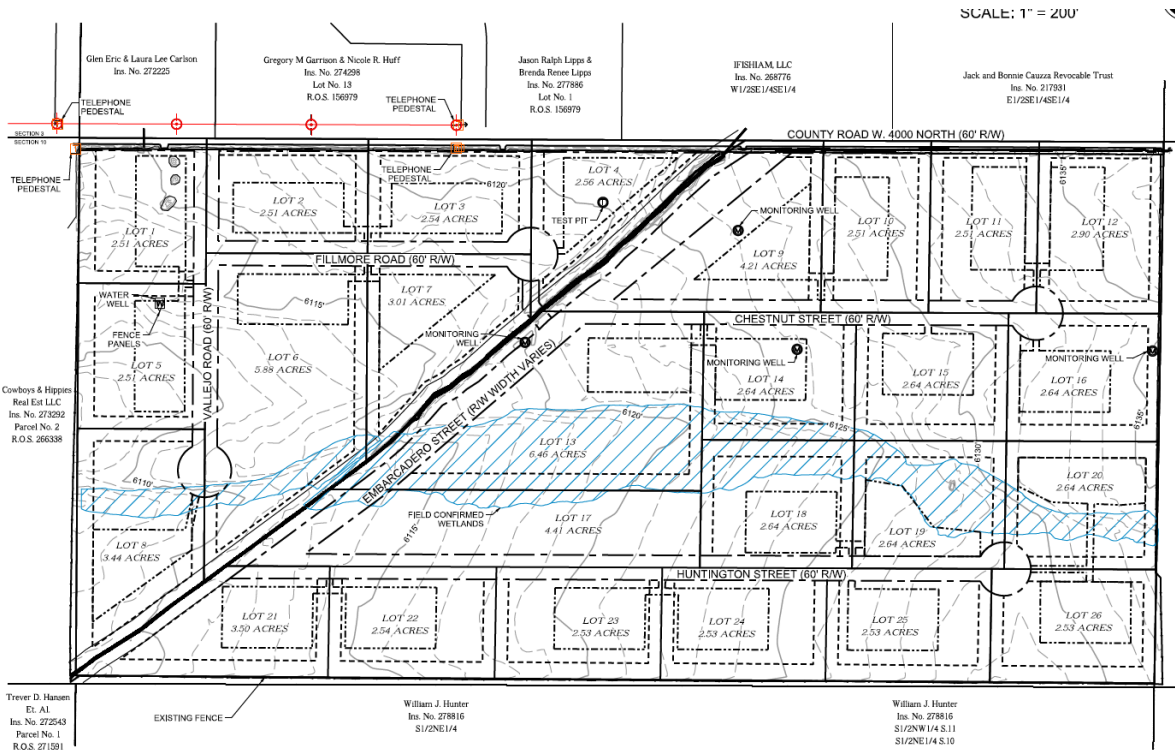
Preliminary Plat (Layout from Improvement Plans for context)
